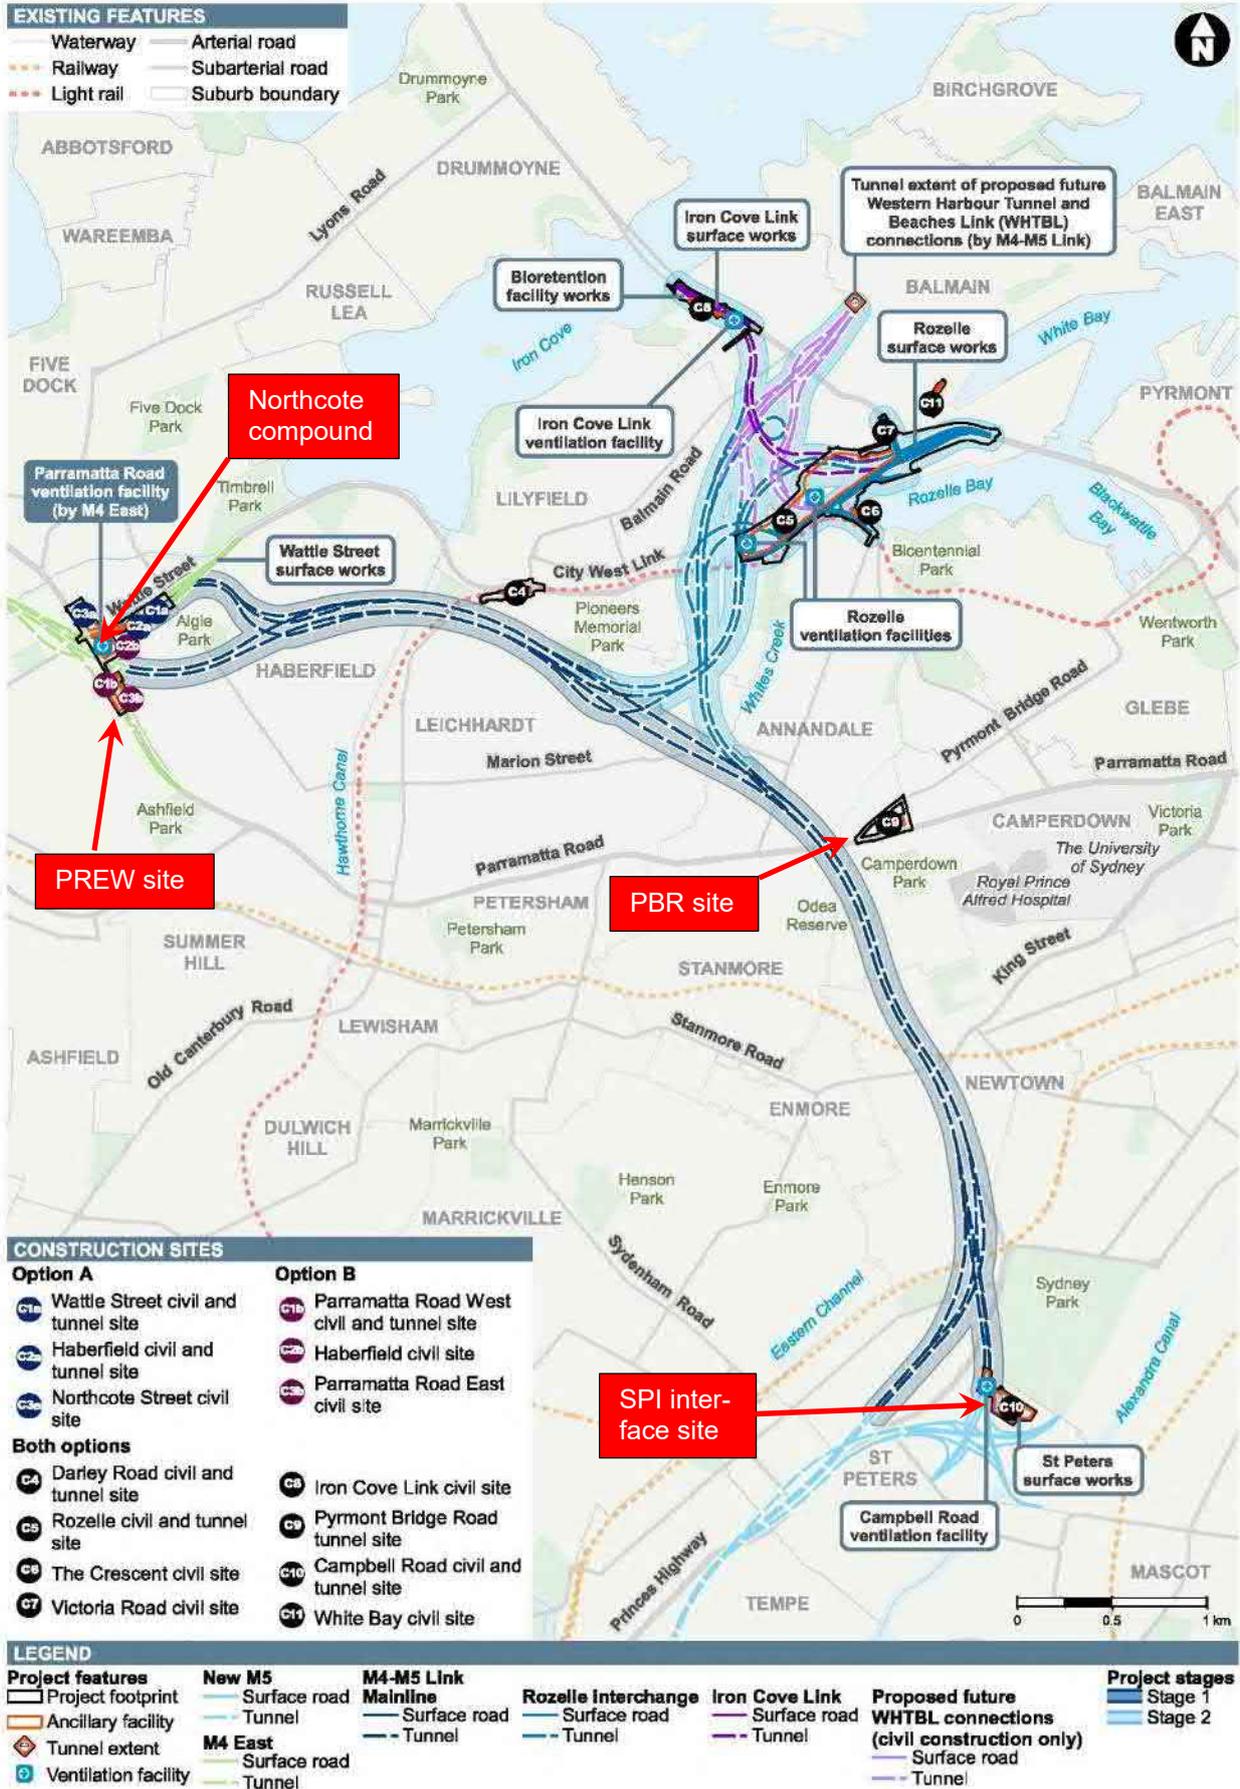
Location Plan for PREW site Areas C1b and C3b
